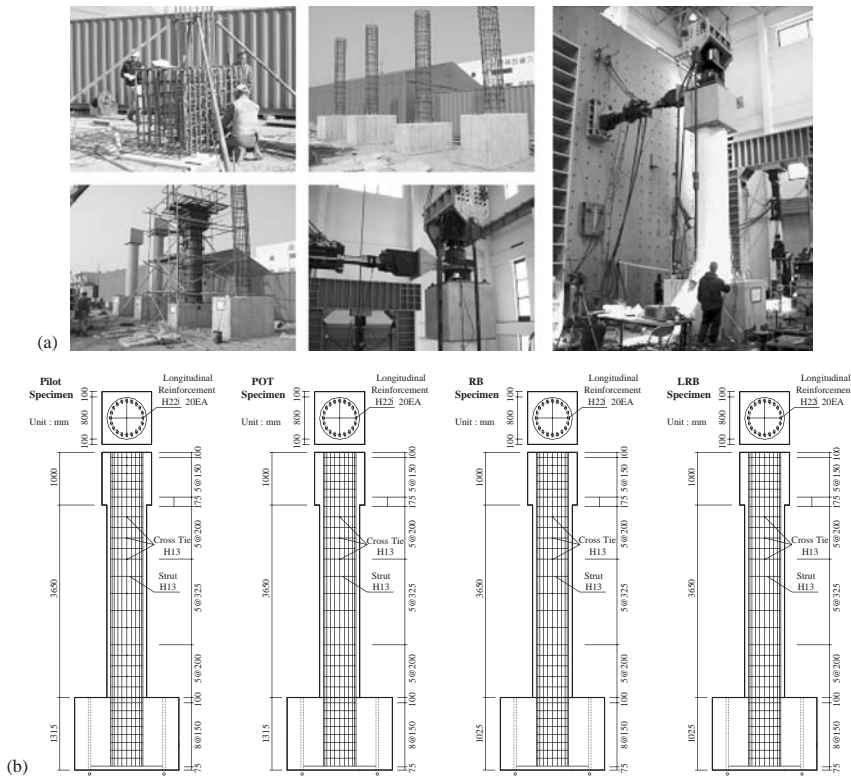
Production of specimens: (a) production and installation of specimens, (b) detail drawings of specimens – PILOT specimen, POT specimen, RB specimen, LRB specimen.
